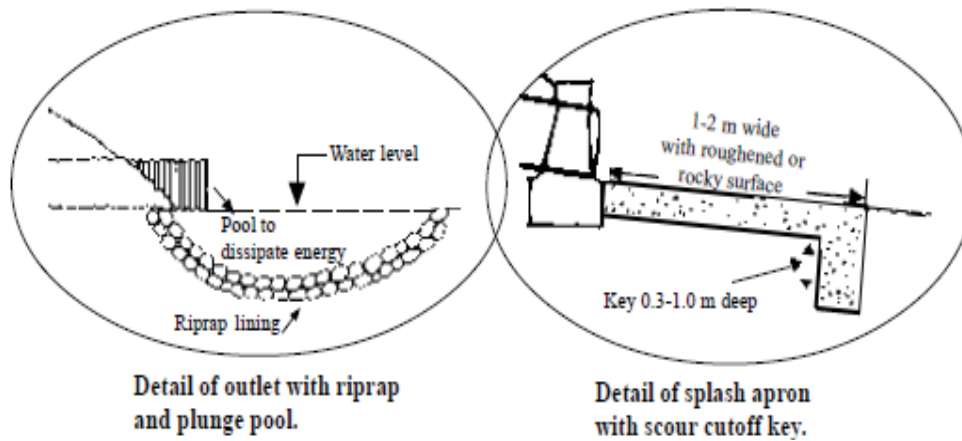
Culvert installation with outlet protection details using splash apron or riprap lined plunge [4]
